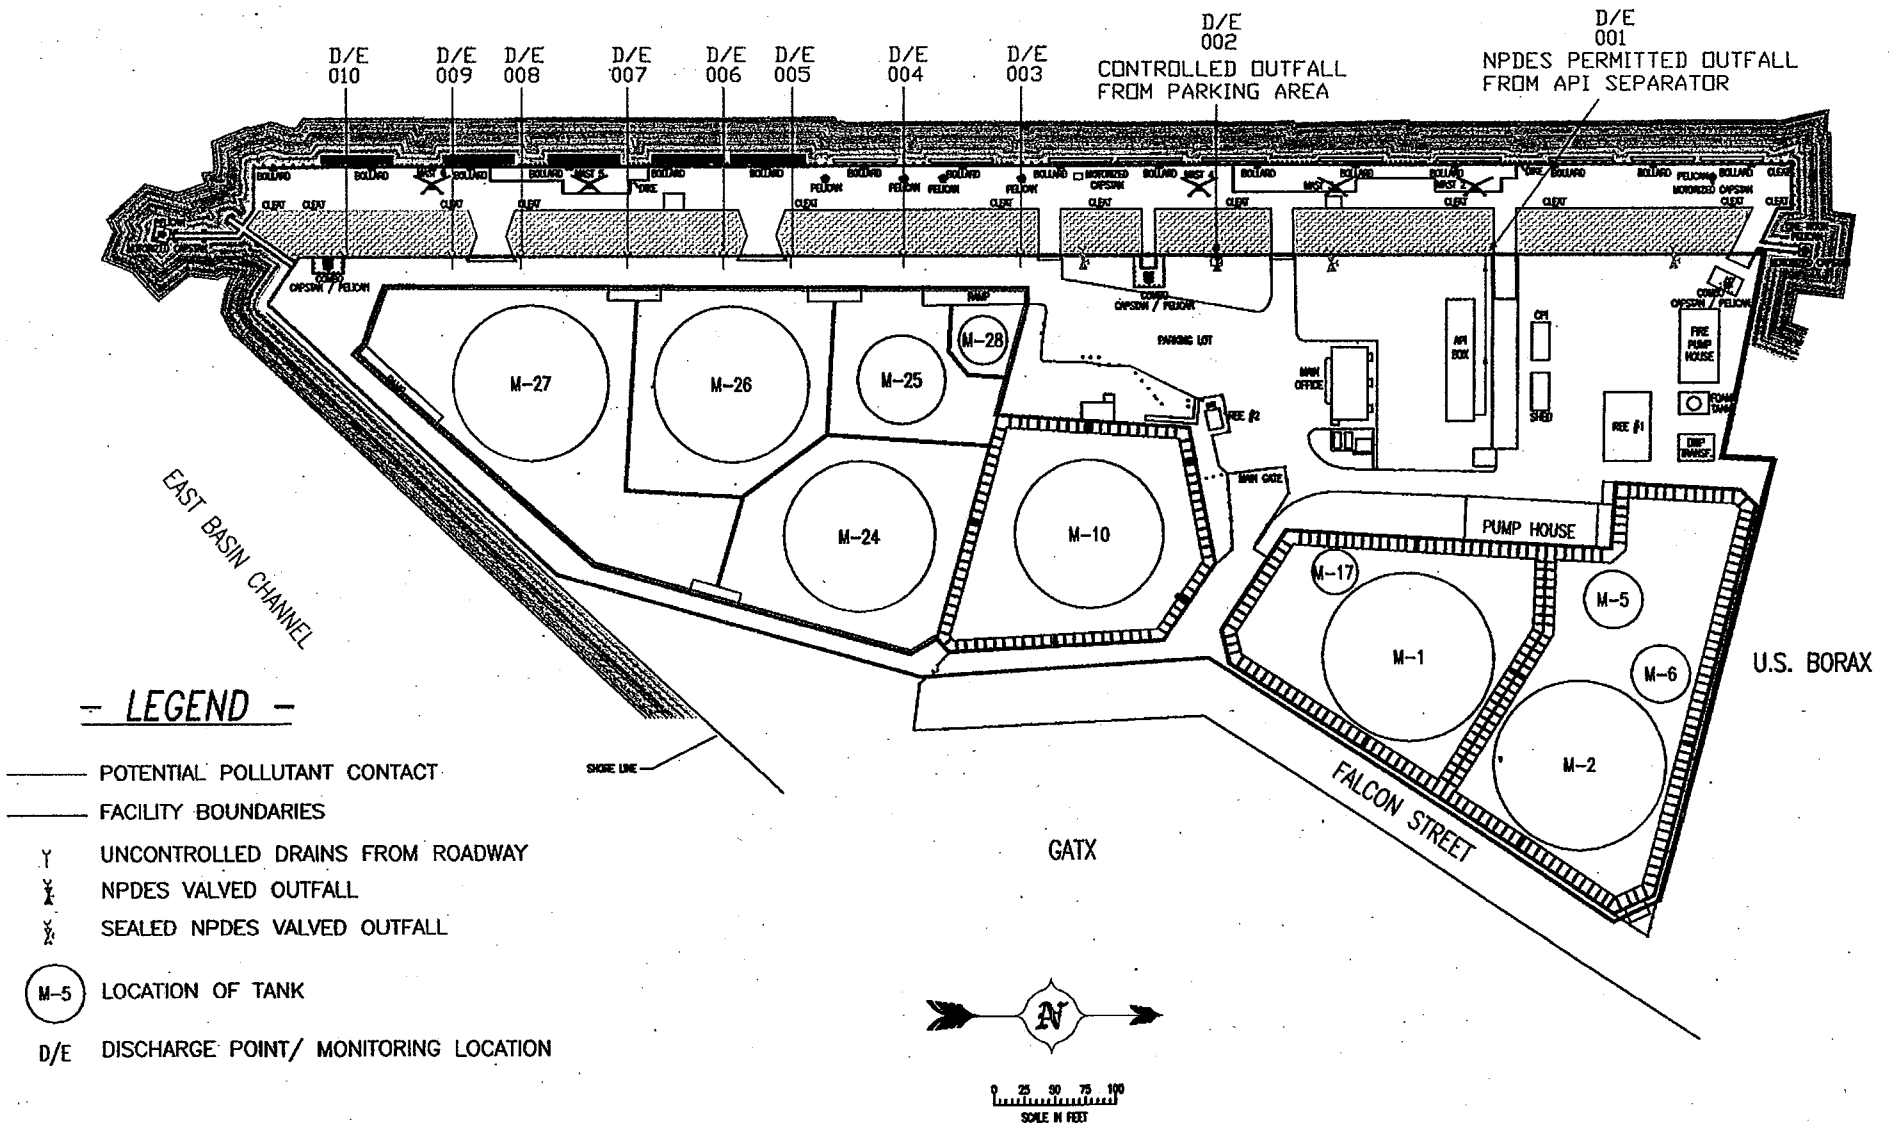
Site Plan, Showing Discharge Points and Monitoring Locations
